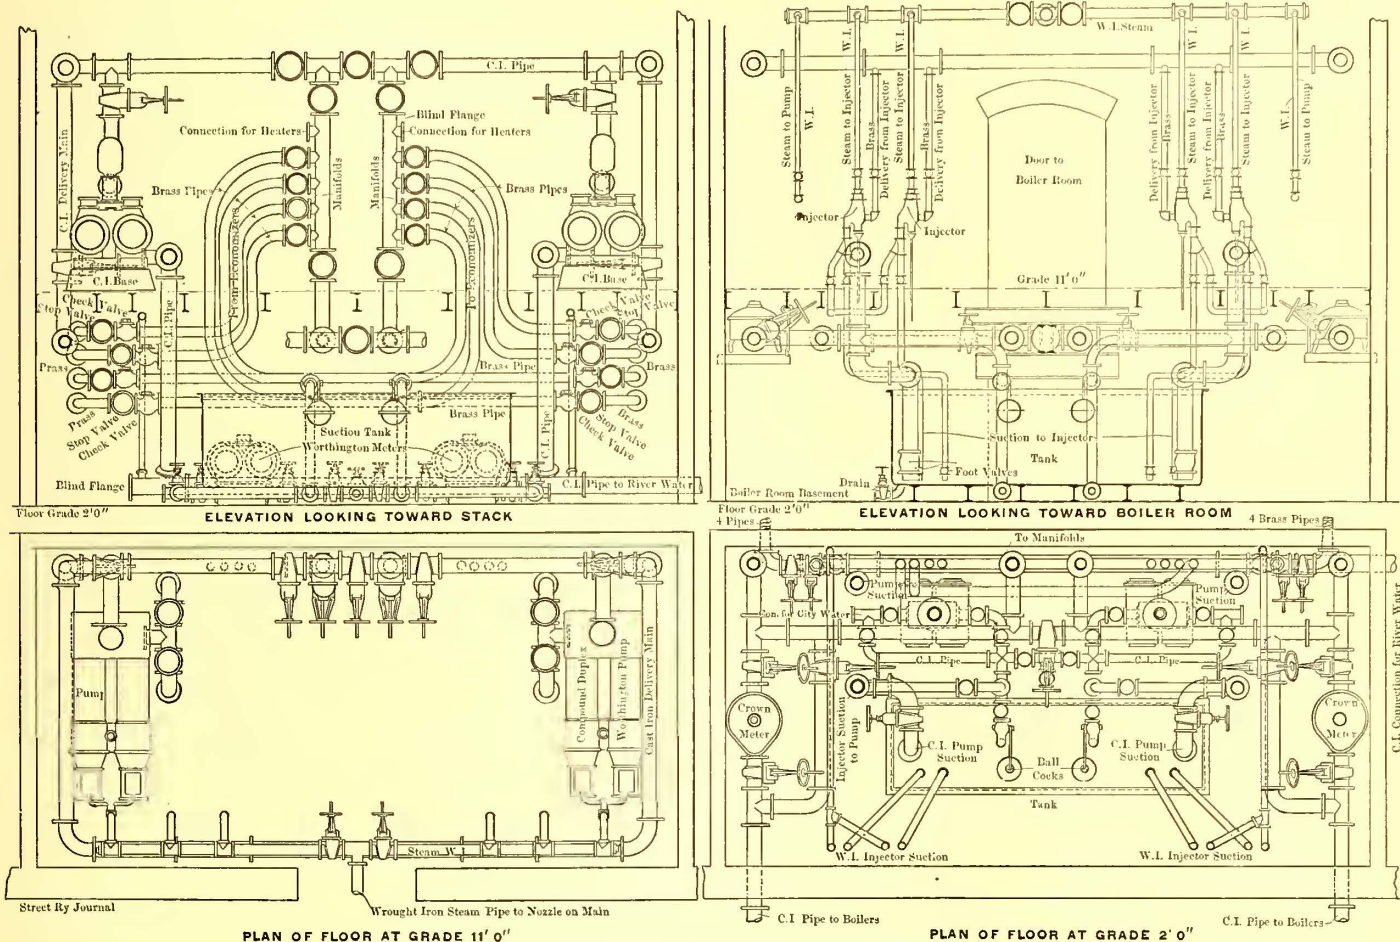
ELEVATIONS AND PLANS OF PUMP ROOM.
